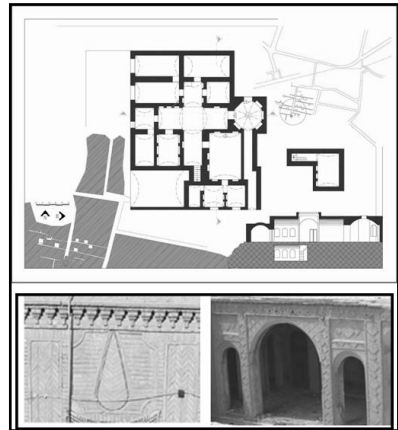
Picture, Plan and section of a Zoroastrian house in Iran
